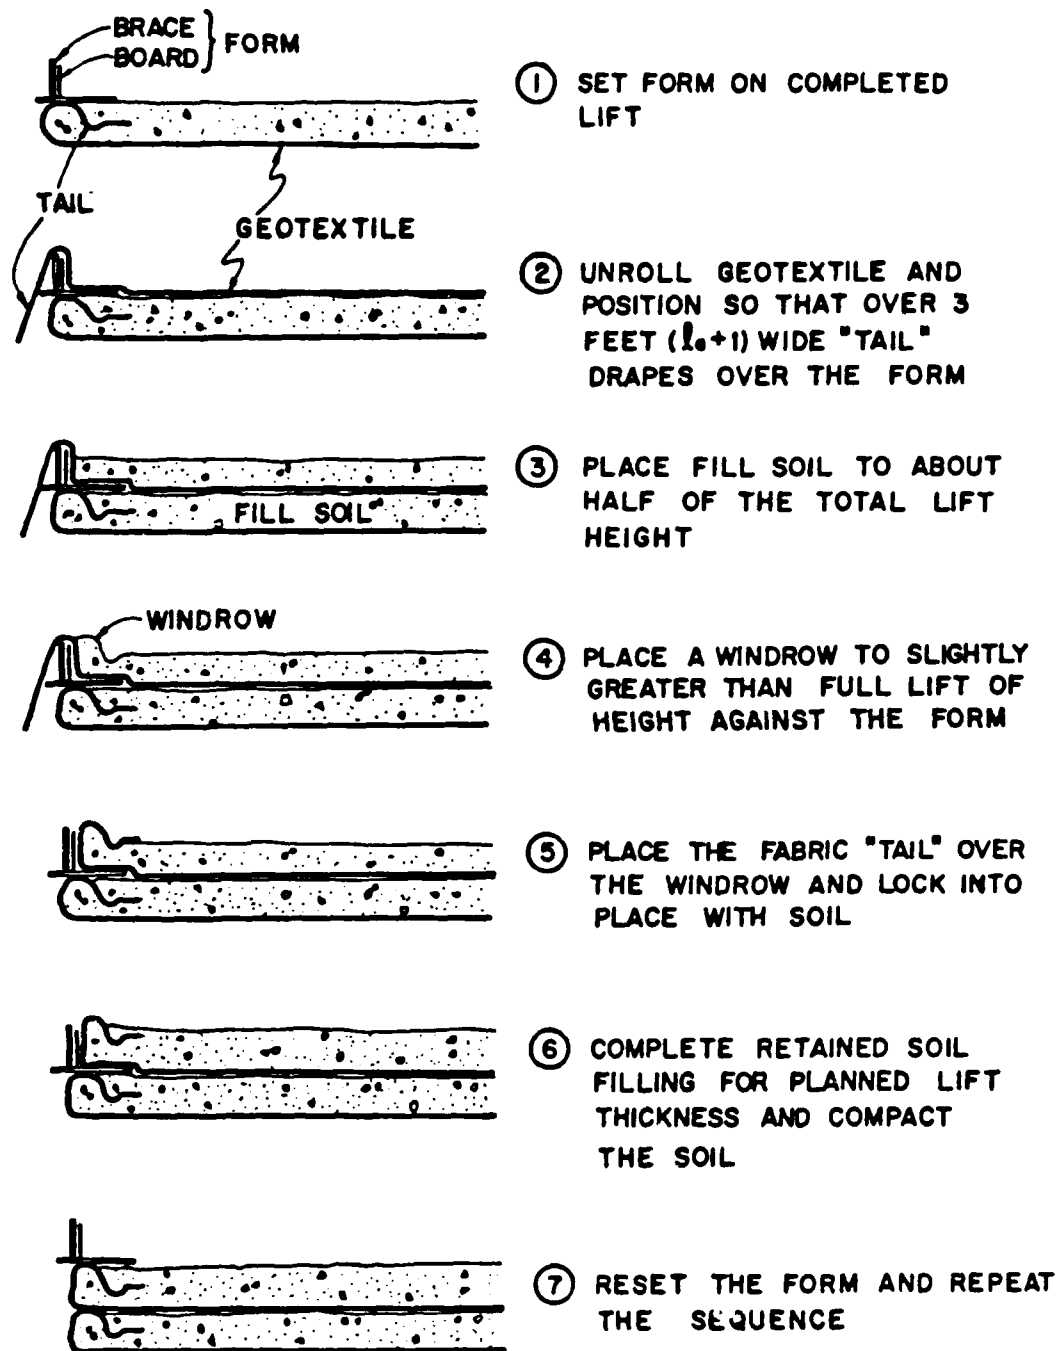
General procedure for the construction of a geotextile reinforced wall (Bell et al (1983))
